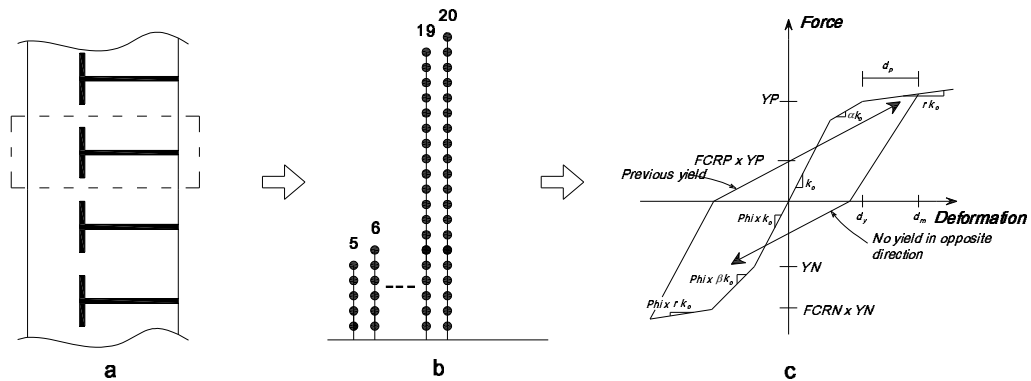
a) Plan view of building with T-shaped walls b) T-shaped walls modelled as stick elements
